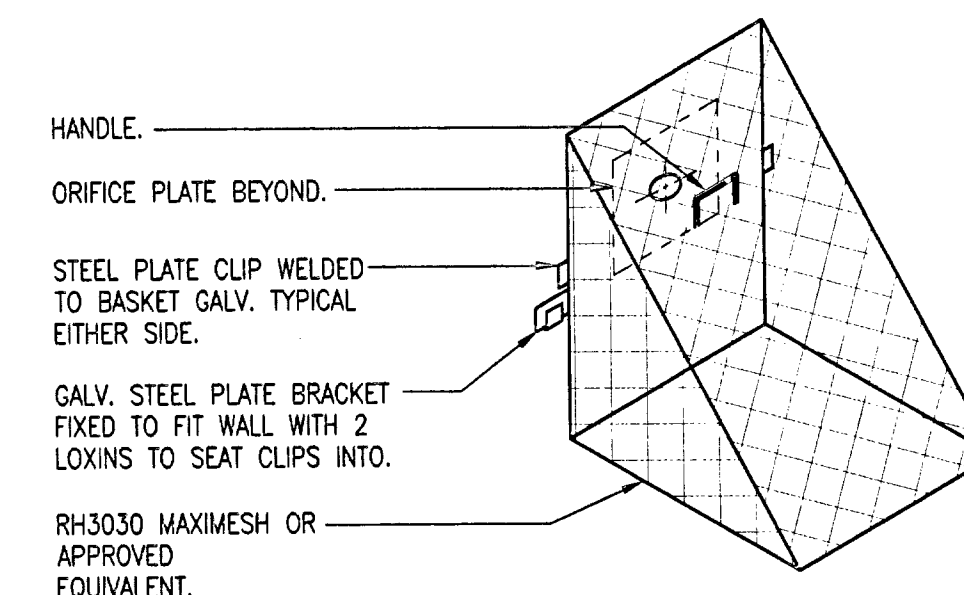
³ ABOVE GROUND ON-SITE DETENTION BASIN
